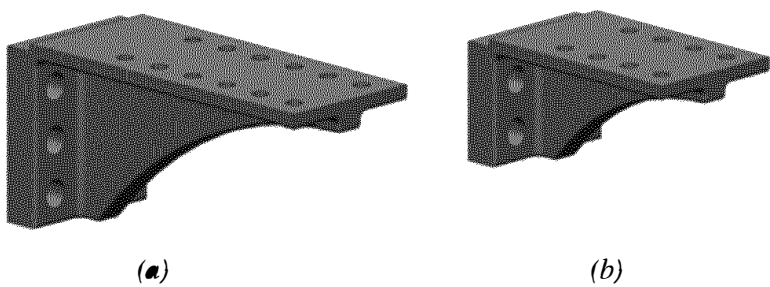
Kaiser bolted bracket B-series configurations: (a) six column bolts, B1.0, and (b) four column bolts, B2.1.
